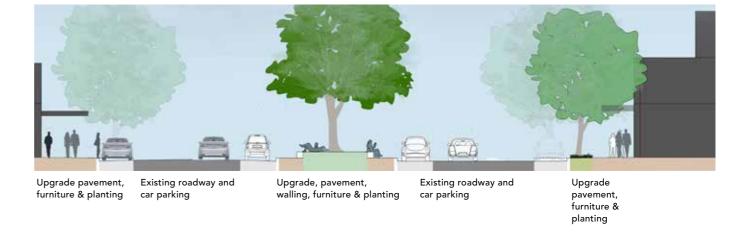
Belle Vue Avenue Indicative Streetscape Section
